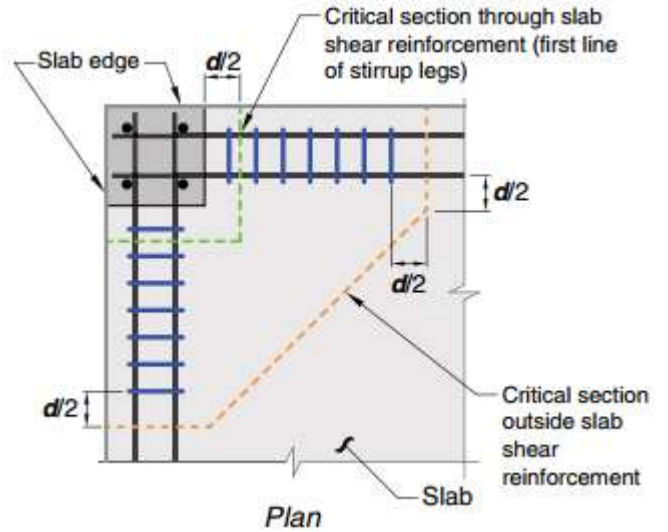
Critical sections for two-way shear in slab with shear reinforcement at corner column.
